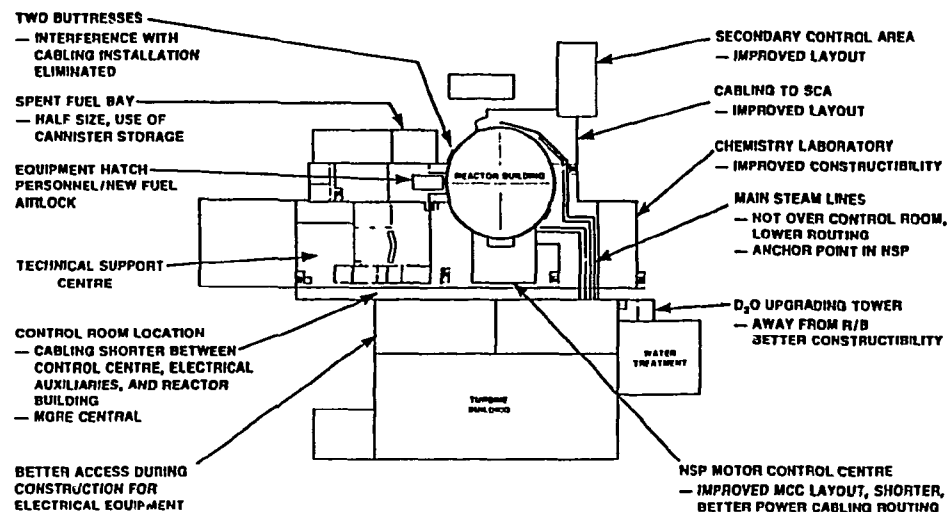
CANDU 6 MK 2 - IMPROVED PLANT LAYOUT
